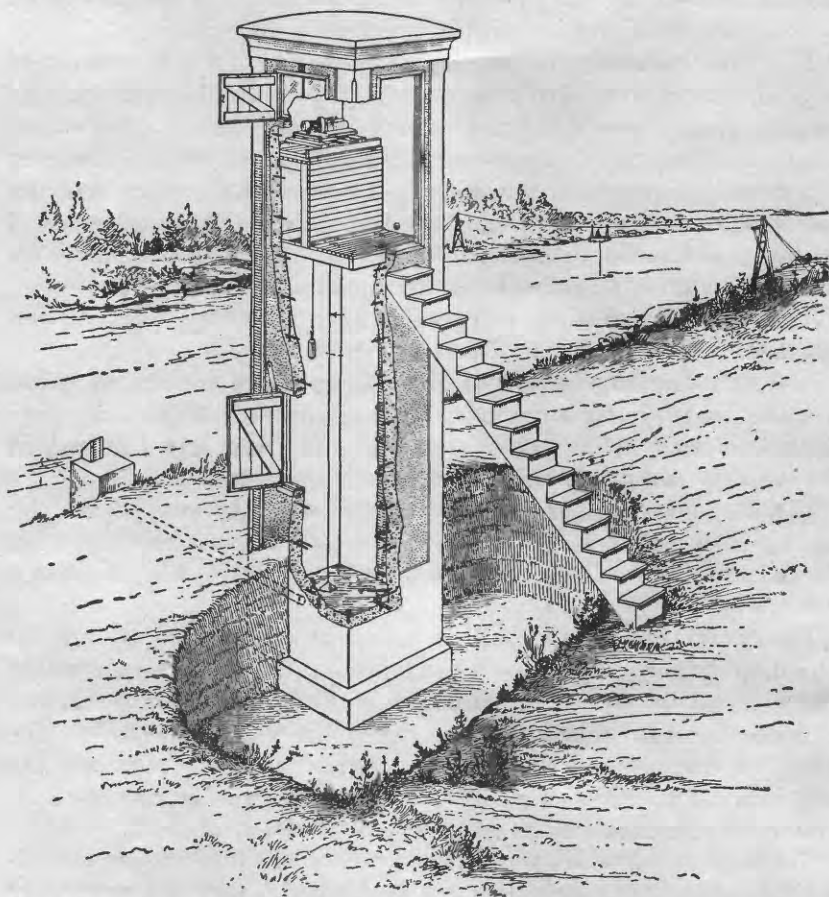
Typical river-measurement station showing concrete well and house for water-stage recorder and staff gages, cable, and car
